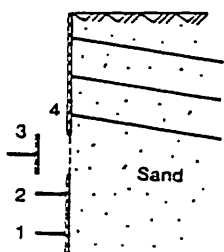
Test layout of a full-scale nailed sand retaining wall (Plumelle et al., 1991, 1991a).
